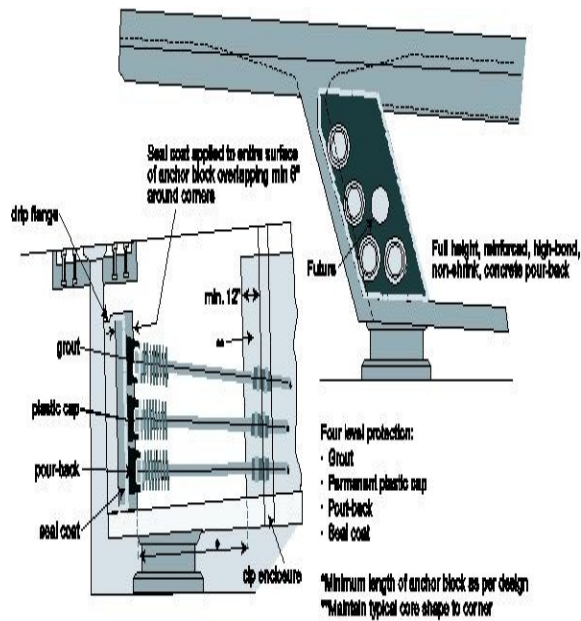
Protection of a group of anchors at an expansion joint segment
